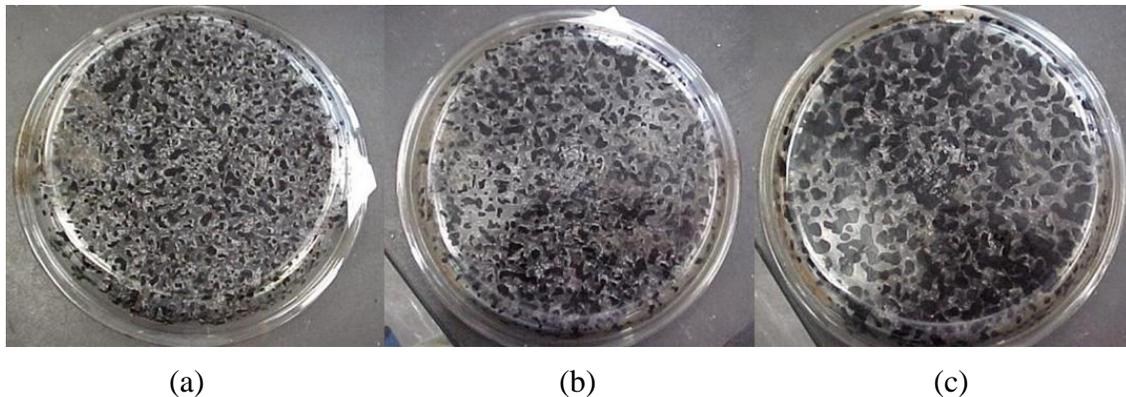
FDOT mix design image references (a) too little binder; (b) just right amount of binder; (c) too much binder
